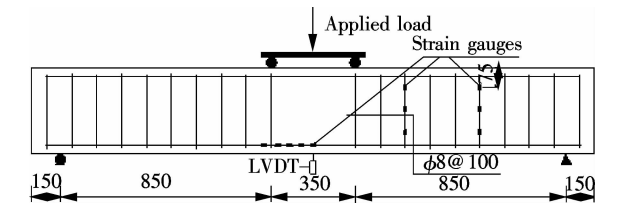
Schematic illustration of test setup and specimen details (unit: mm)
